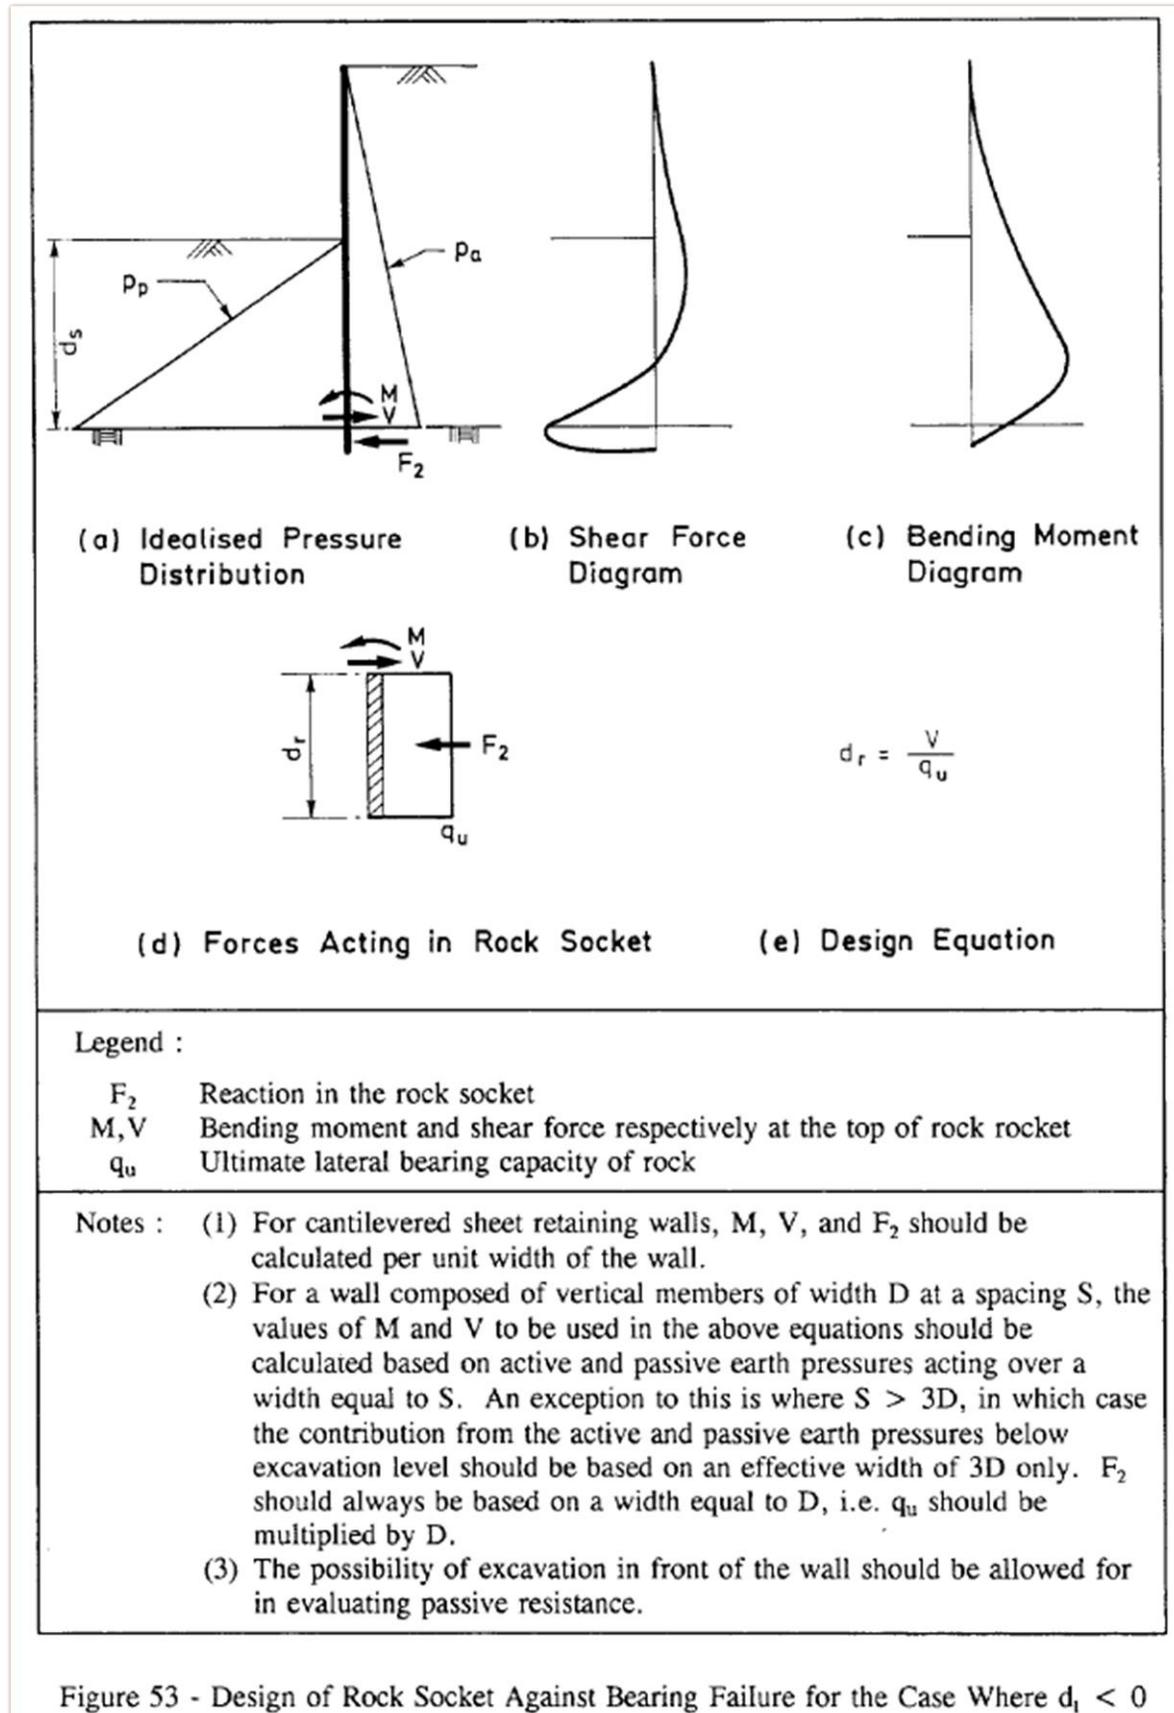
Design of Rock Socket Against Bearing Failure for the Case Where  $d_1 < 0$
